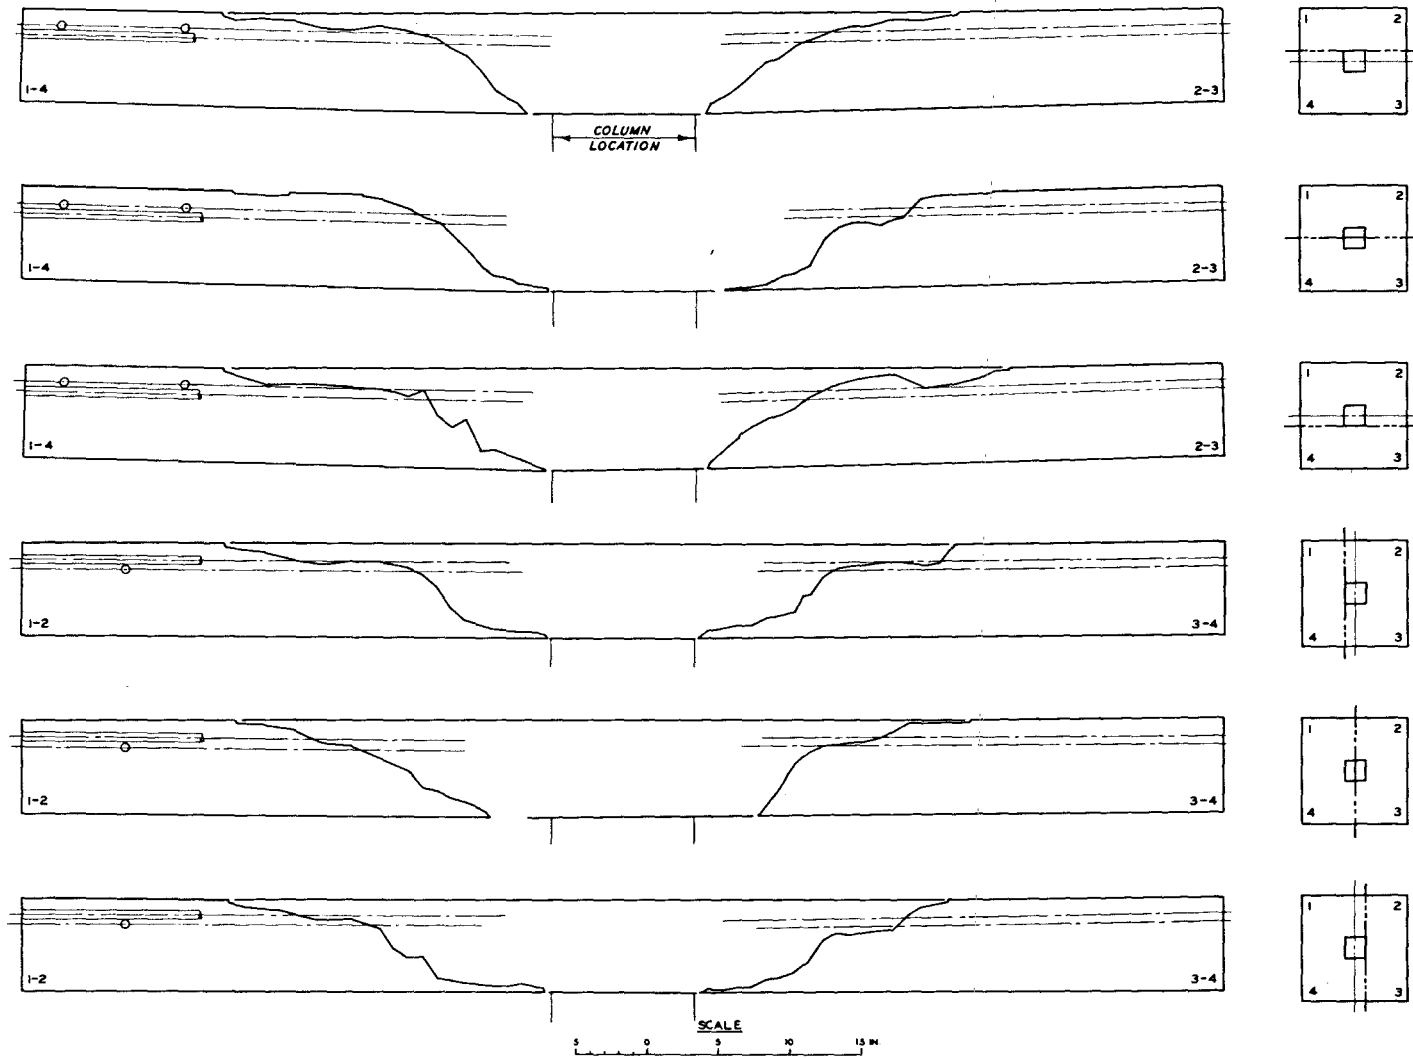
Profiles of slab failure surface, Specimen D2075-3.
